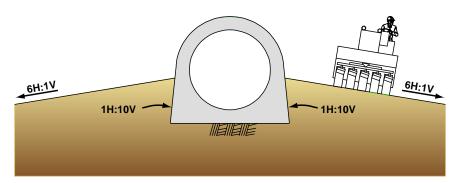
Recommended earthfill ramp and conduit side slopes.
